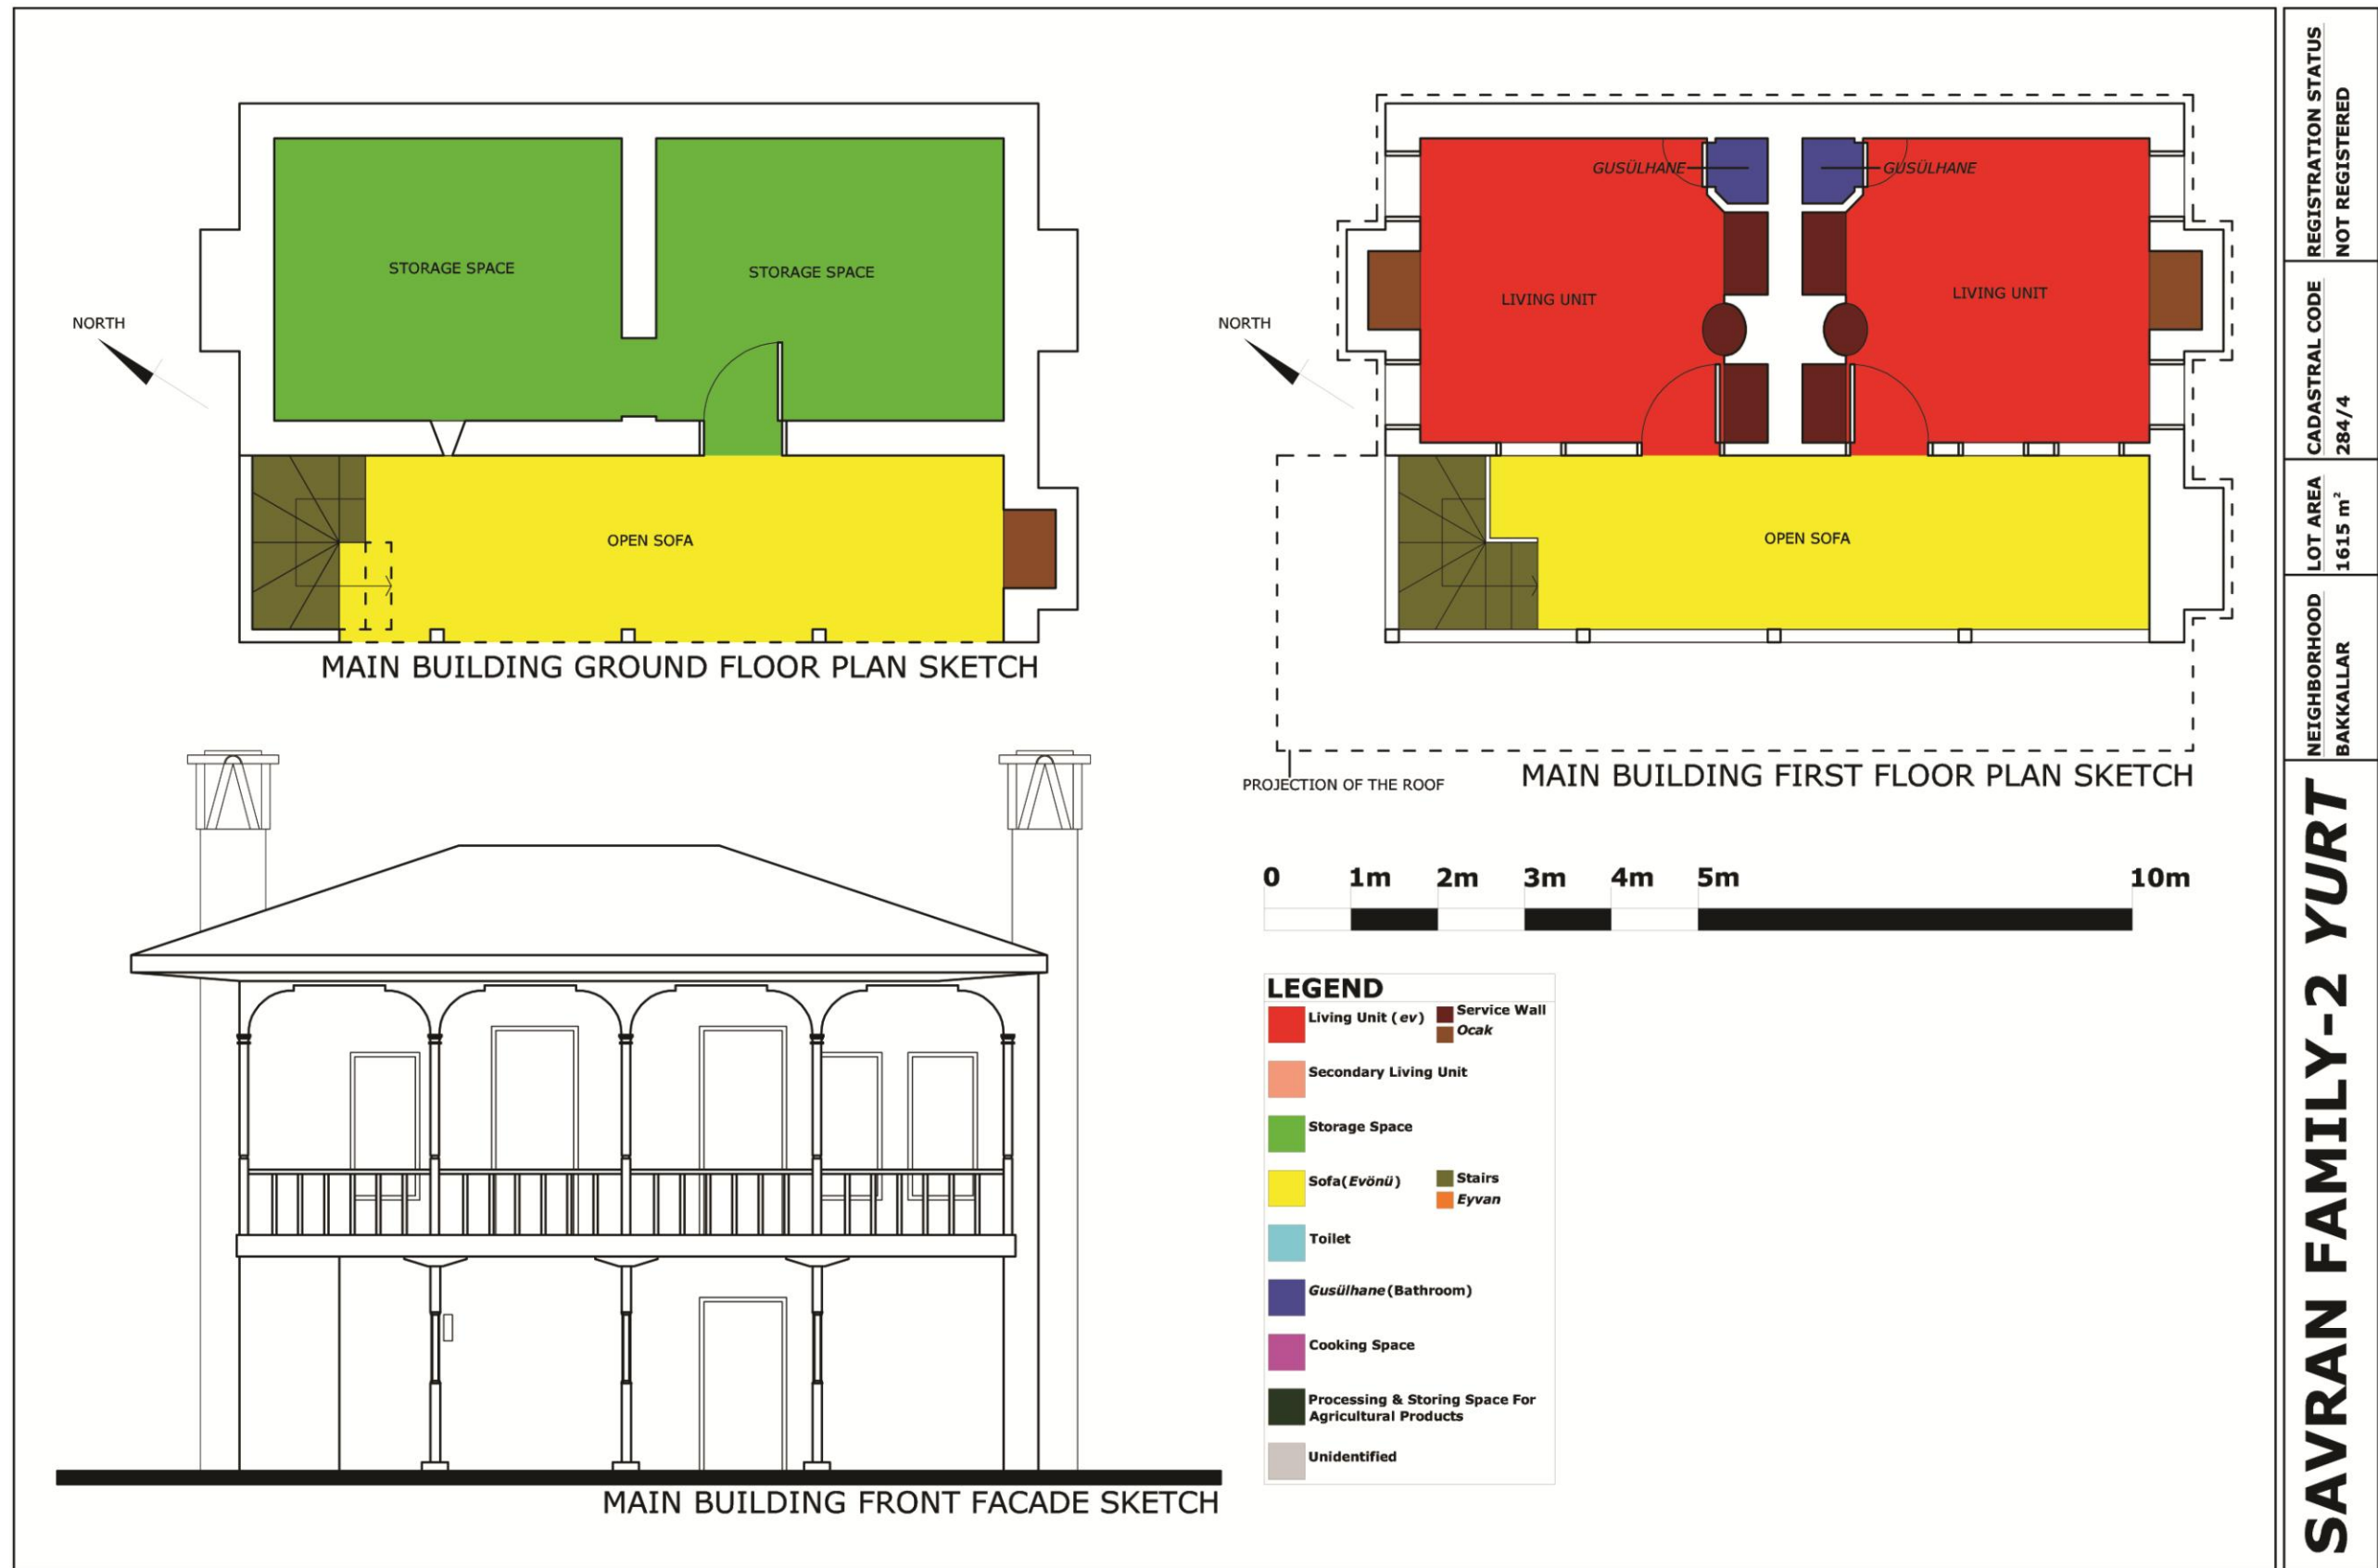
Plan and front façade sketches of the traditional building in *the yurt* of Savran Family-2
